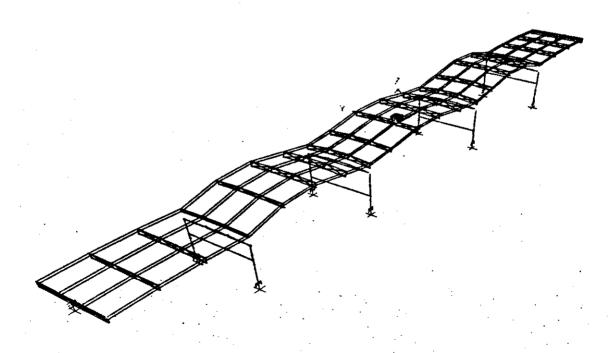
Mode 3, Period 0.1809 Seconds (Old Wahite Ditch Bridge)
